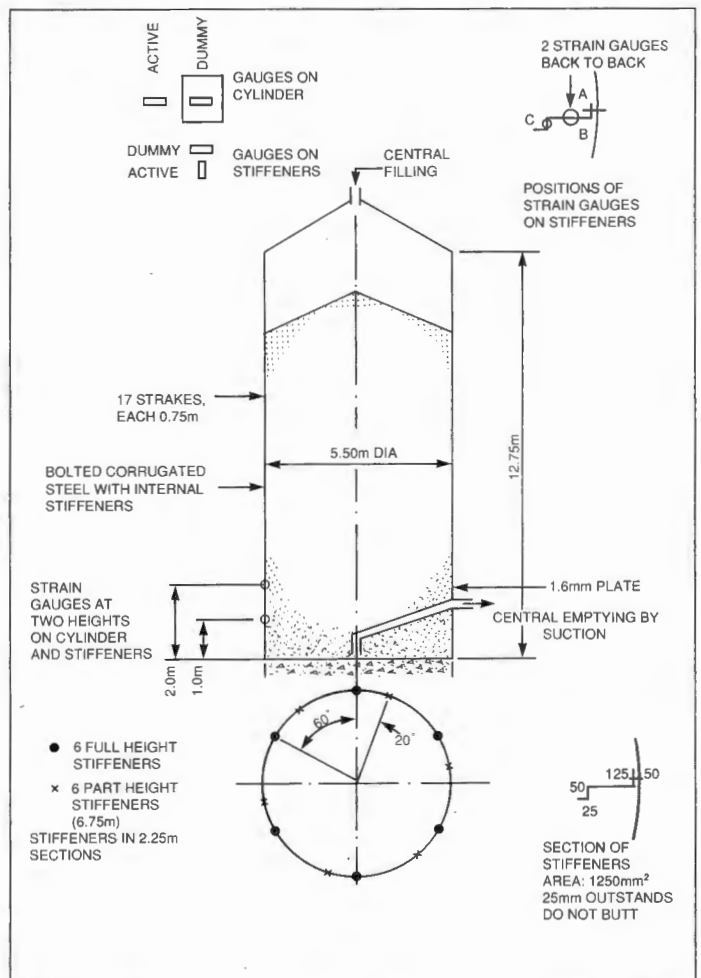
Main Dimensions and layout of the silo. Layout of strain gauges in elevation and plan
